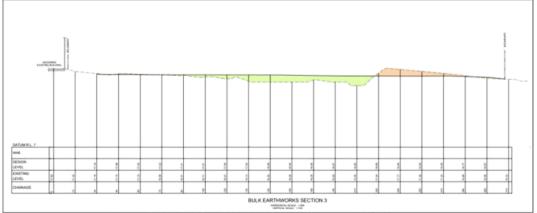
Site Section 3 (See Figure 5) Source: Craig & Rhodes
